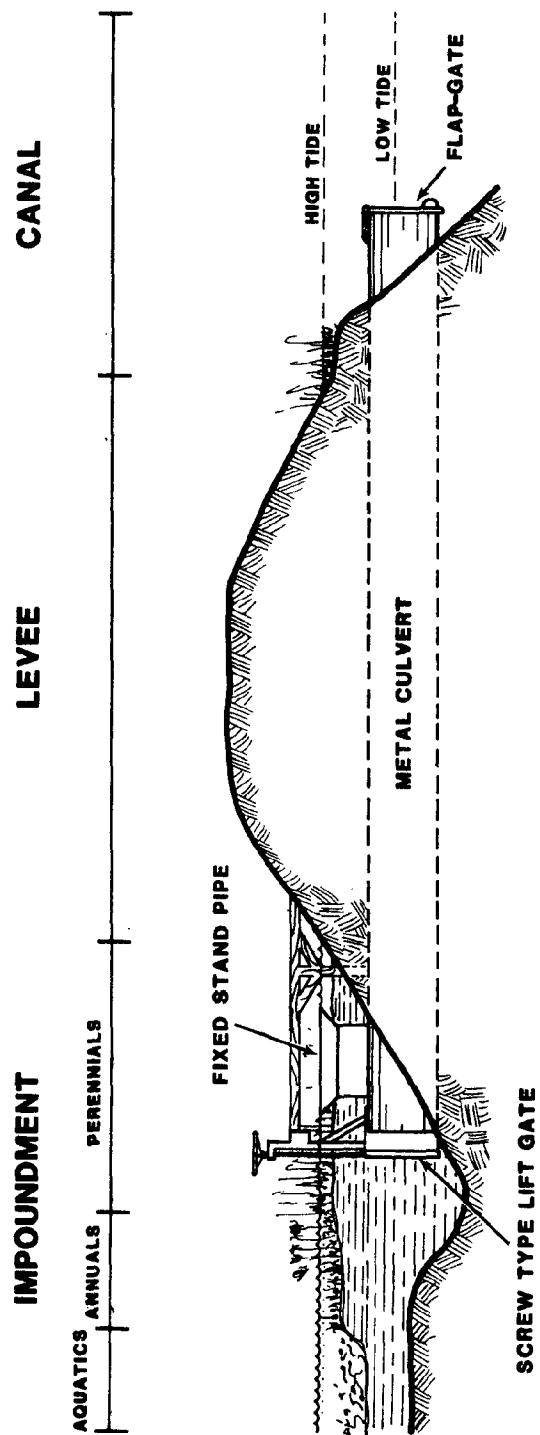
Schematic longitudinal section of a 36-inch flap-gated metal culvert.
